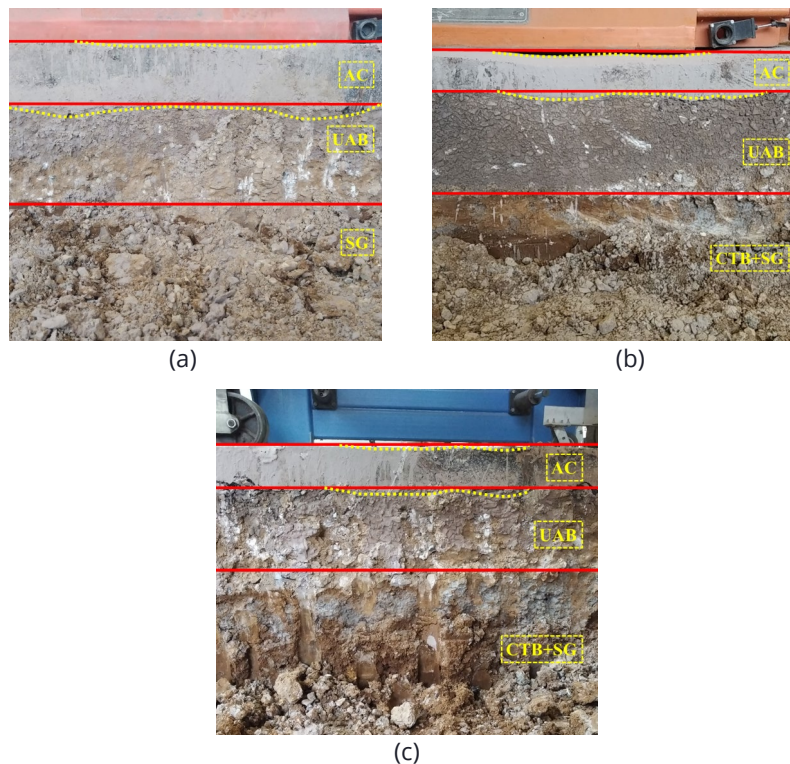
Trench sections at the middle of (a) conventional pavement, (b) inverted pavement I, (c) inverted pavement II
